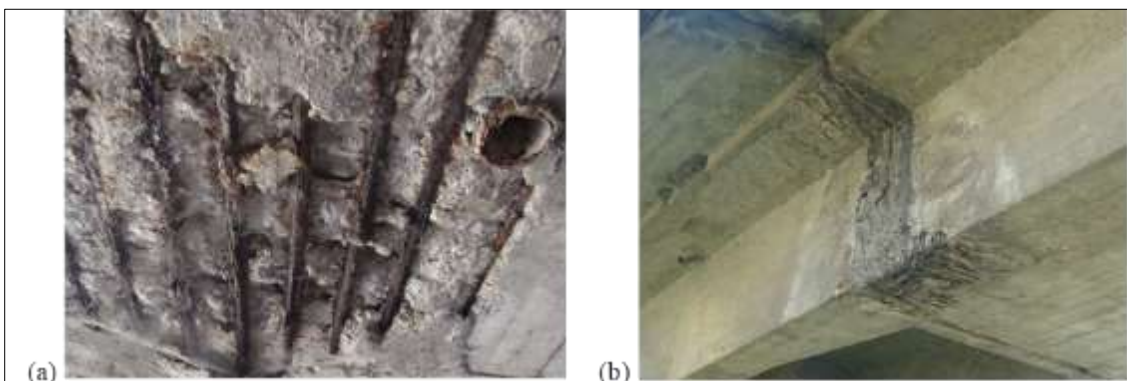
Concrete carbonation in a bridge deck due to water exposure caused by malfunctioning of the drainage system (a) and insufficient waterproofing of expansion joint (b)
